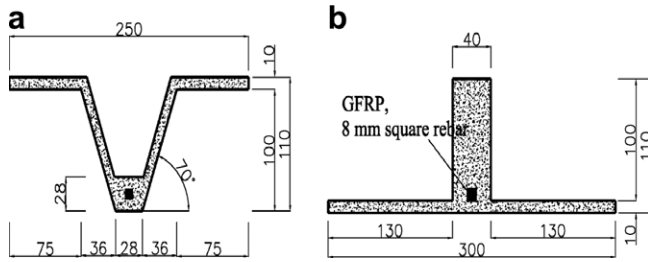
Typical FRP reinforced GFRC section: (a) Type M13, (b) Type M5.
